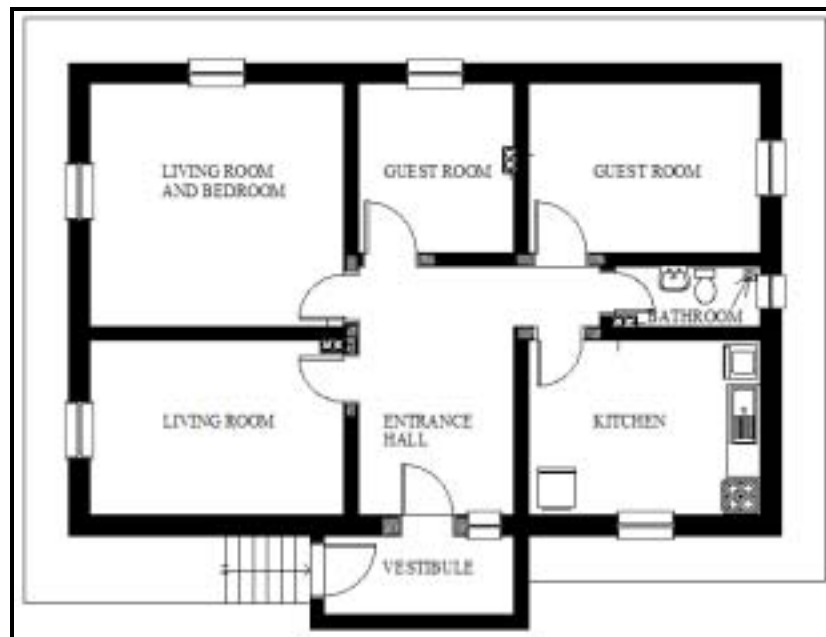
Modified Plan of the PDH with *Typical Design* in Yuva Village -
